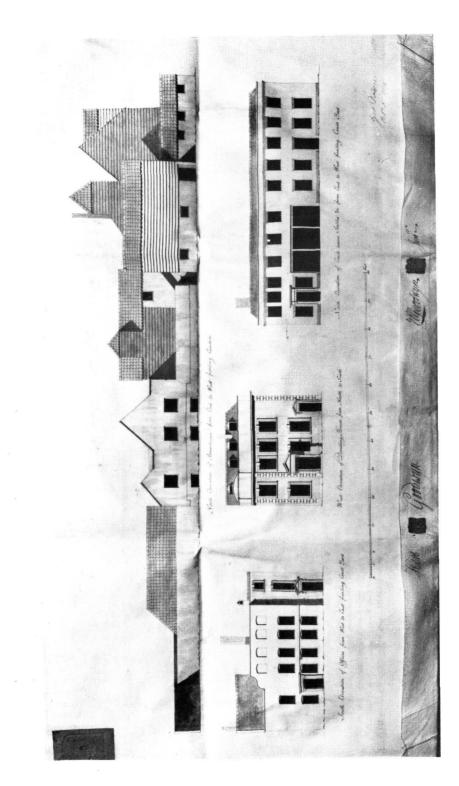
Butcher Row: Elevation of house and north elevation of the brewhouse, 1771
